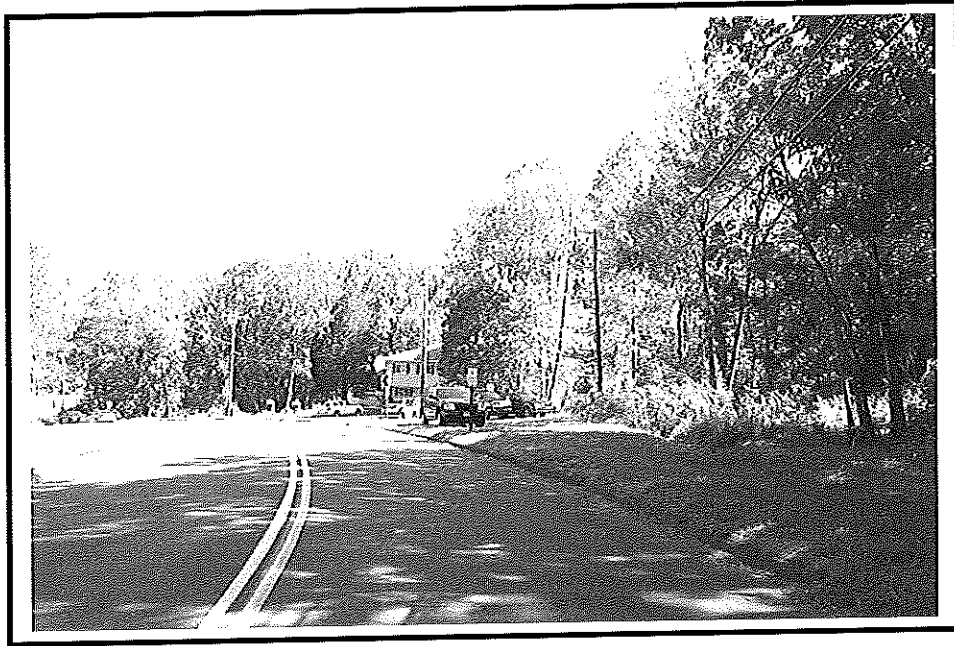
Southeasterly view along Country Club Road with the subject accessway road frontage on right.
